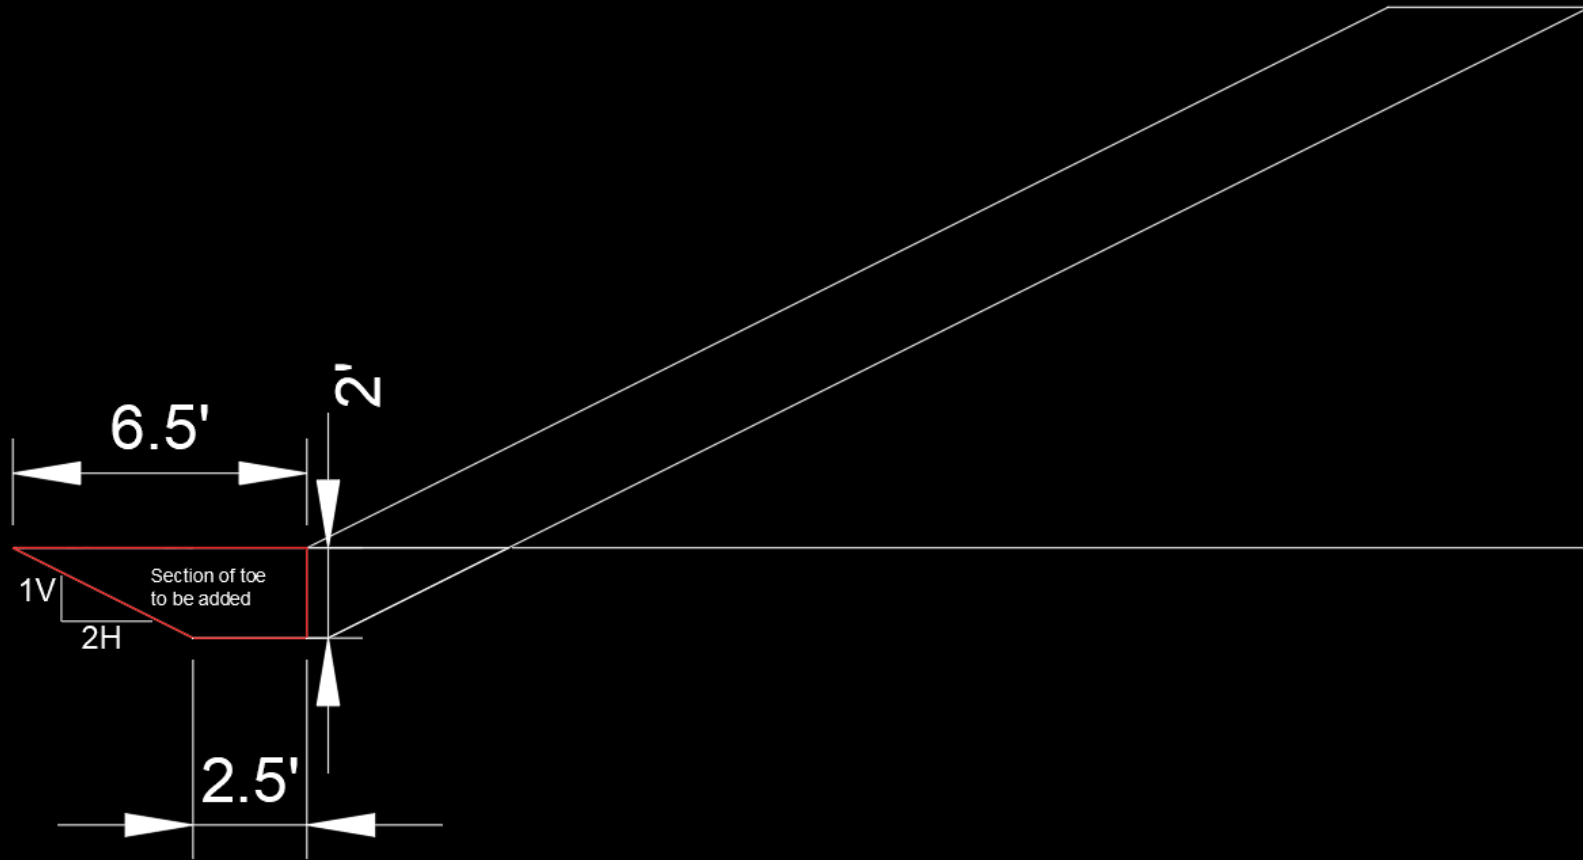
Cross Sectional View of Original Levee Section Repairs.
